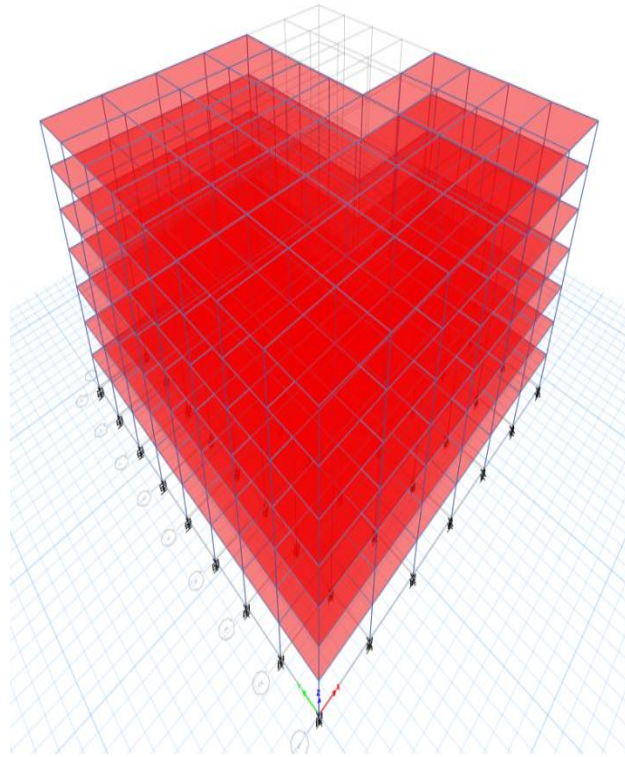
Three Dimensional view of G+6 RCC Frame Building Using FREI
